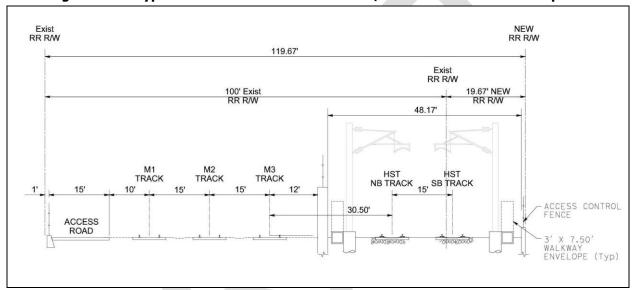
Typical Cross-Section – Montebello / Pico Rivera – At-Grade Option
